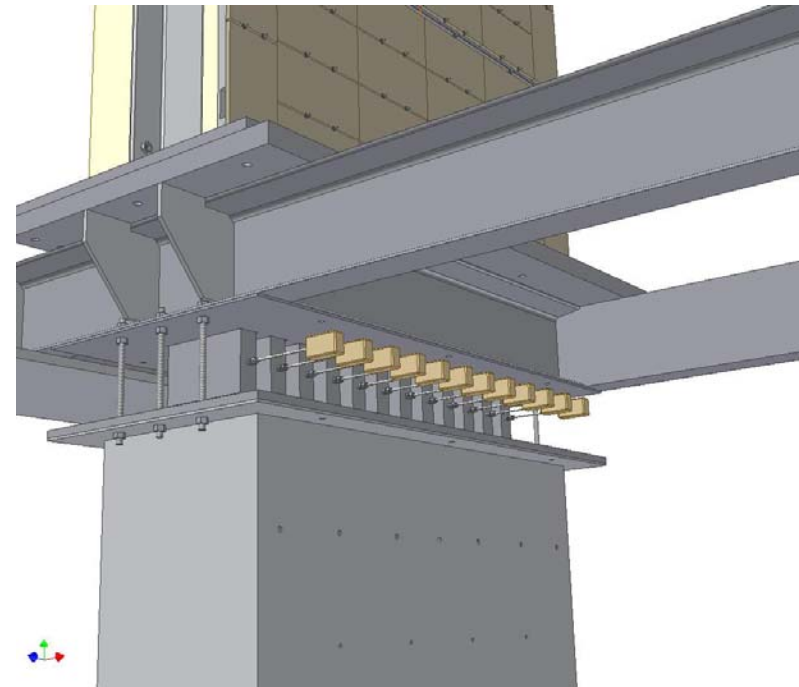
RCCS Tube Expansion Joint Assembly.
